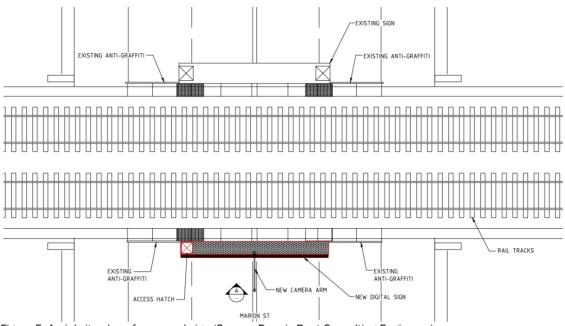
Aerial site plan of proposed sign (Source: Dennis Bunt Consulting Engineers)
